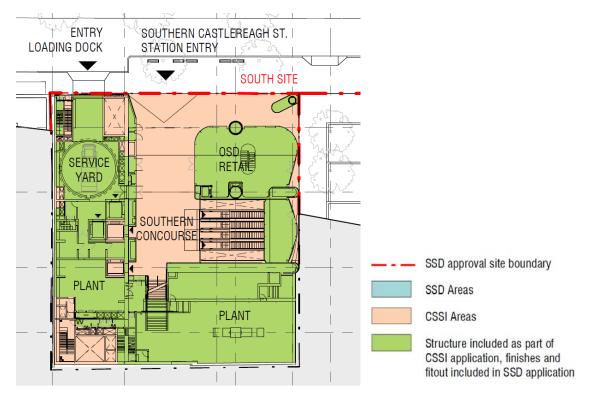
Lower Ground Floor (Castlereagh Street) CSSI / SSD demarcation plan for the South Site Source: Grimshaw
